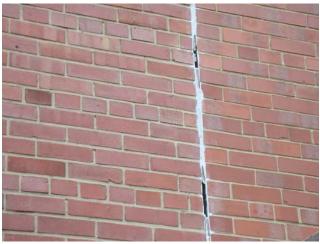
Sealant failure and open joint in masonry at expansion joint
